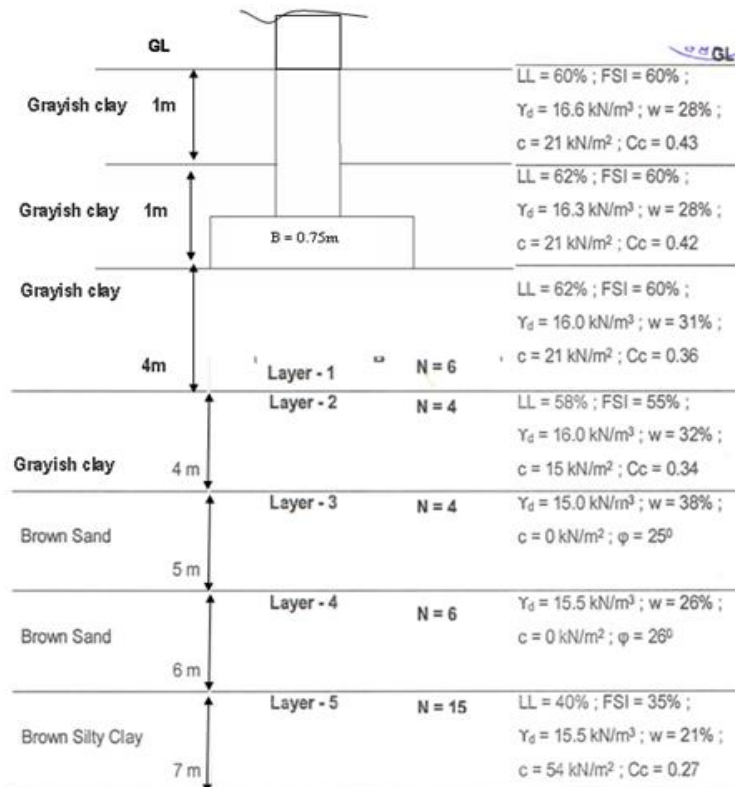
Soil profile below foundation (worst soil profile from BH1 to BH7)
